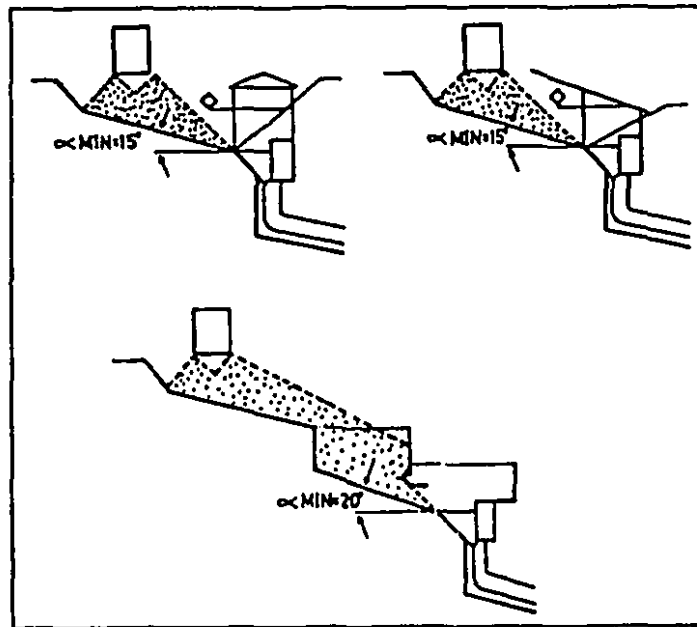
Simple surface sandfill preparation station<sup>[49]</sup>
